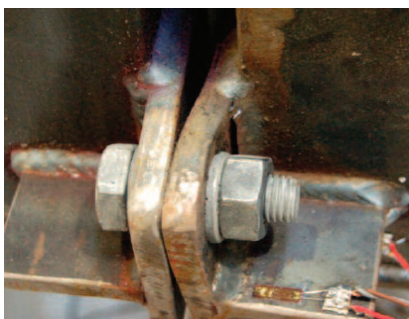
Typical deformation of end plates (T5 strain gauge visible) with a crack at the edge of the vertical weld
